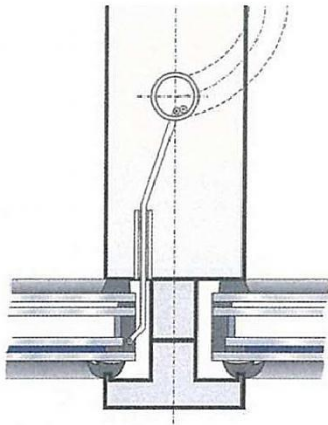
Detail of PV module fixing by using pressure plate fixing on mullion-transom stick system and cabling in the profiles (Planning and installing, 2008).
